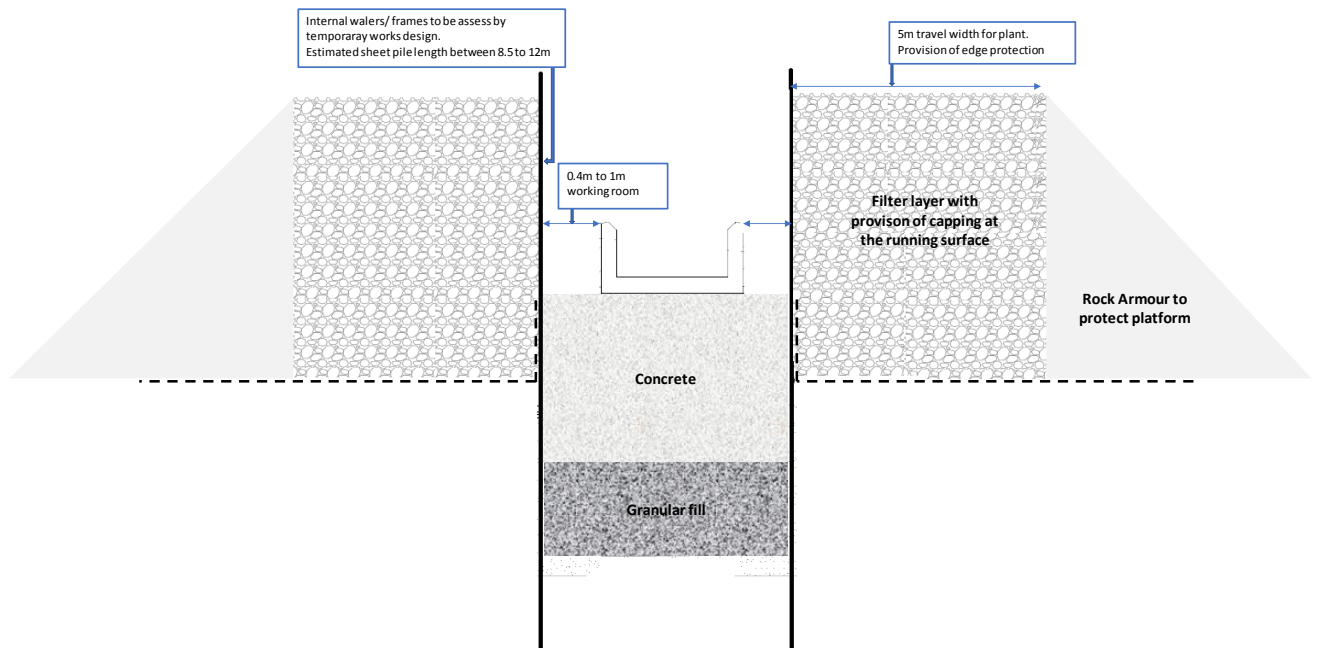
section through proposed cofferdam (see appendix 7 for clarity)
